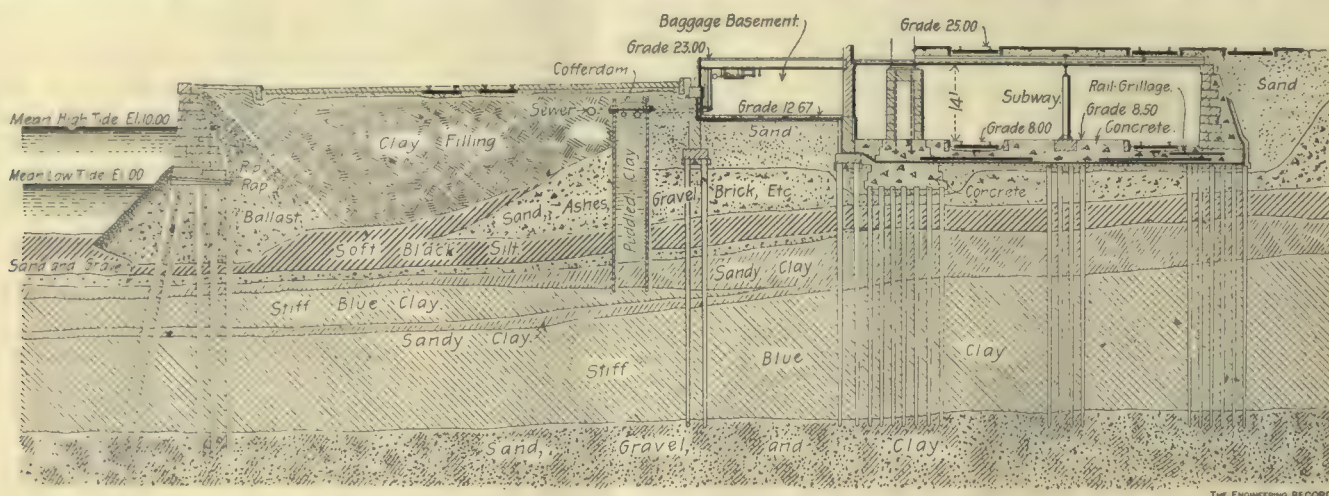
CROSS SECTION THROUGH DORCHESTER AVENUE AND SEA WALL.
